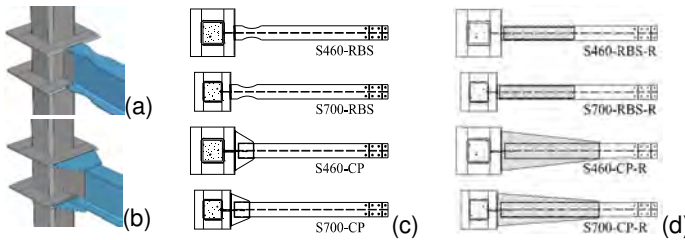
Welded external diaphragm beam-to-column joints with reduced beam section (a), and cover plates (b), designed joint specimens (c), and corresponding joint specimens with reinforced beam (d)
